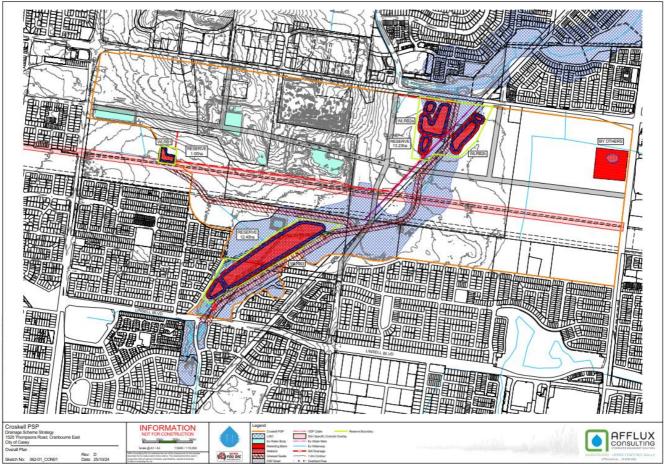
Overall drainage proposal (See Appendix A for full details)
